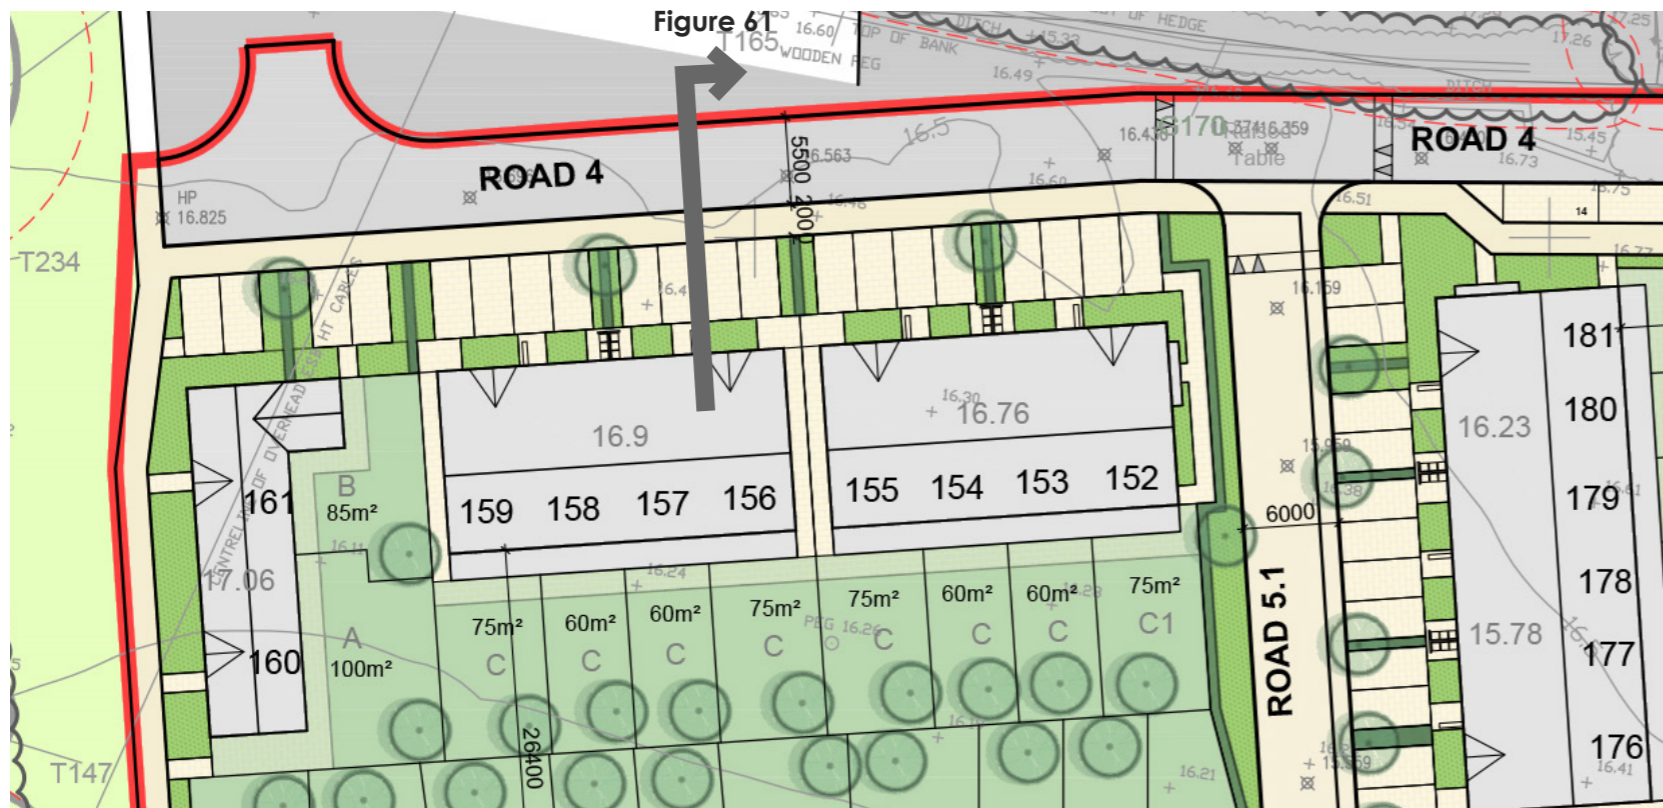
Detail layout of deep-plan and wide-front houses with parking on curtilage. Source: MCORM, 2022.
